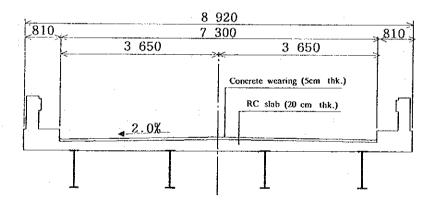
CROSS SECTION OF THE PROJECT BRIDGE
